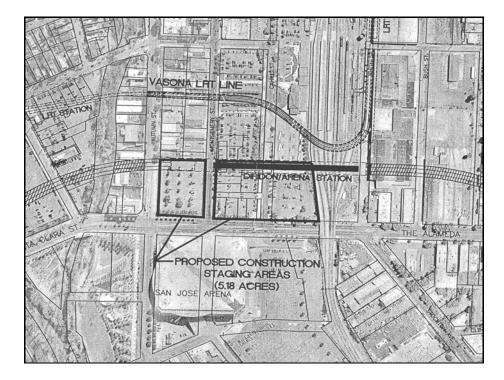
Construction Staging Site South of West Santa Clara Street on Either Side of Montgomery Street
